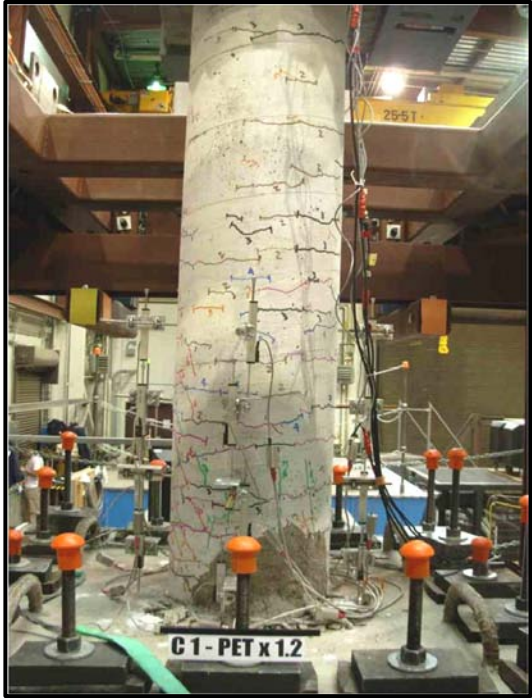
Specimen C1, Column Distress (PETx1.2)
